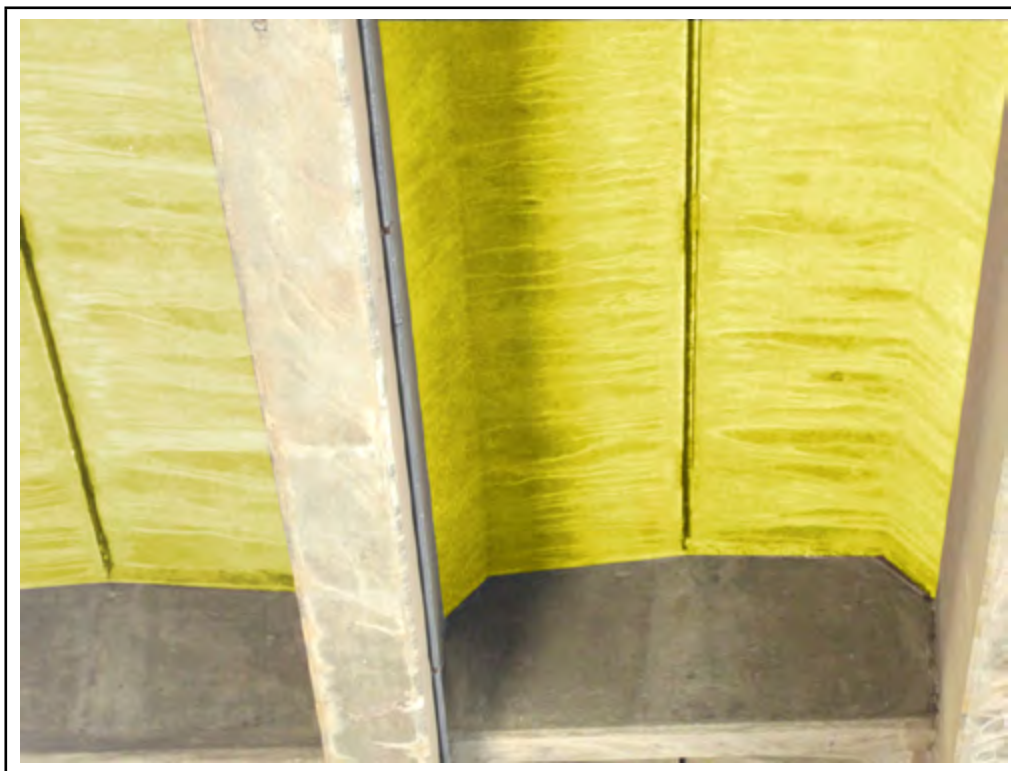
Prestressed Concrete Top Flange (Highlighted)
